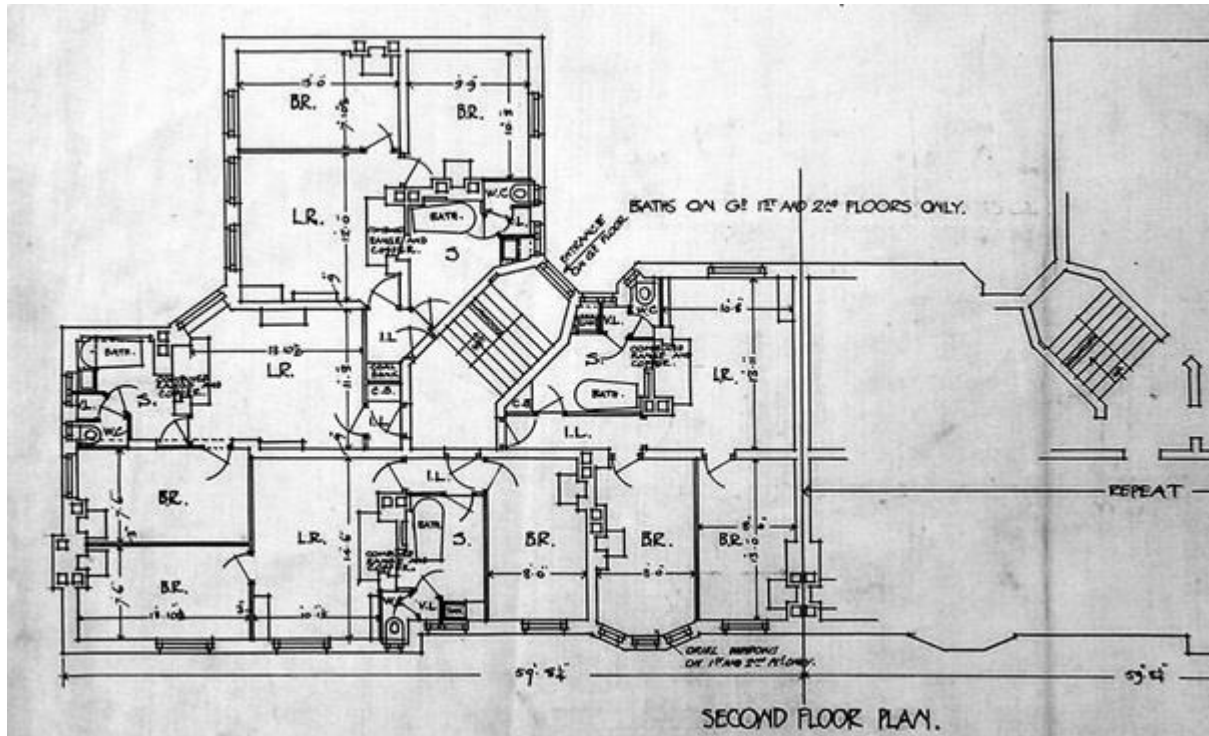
Bearcroft Buildings floor plan (LMA ref: LCC/AR/HS/03/057)
